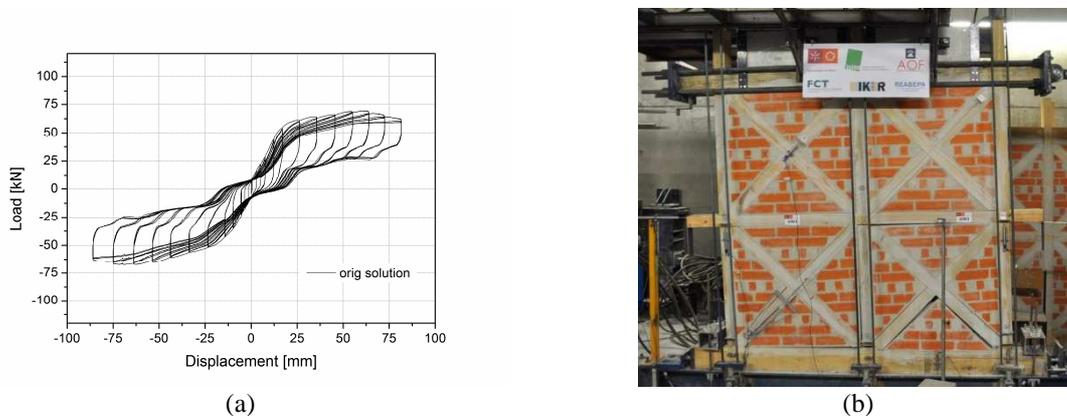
Wall with original bottom beam/ post connections: (a) hysteretic curves; (b) flexural behaviour of the wall during the test.
